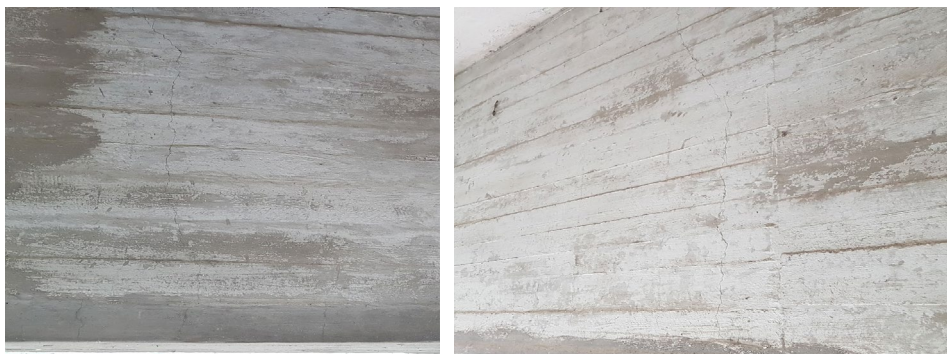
Transversal cracks on concrete arches (upper) and concrete degradation and humidity (lower).
